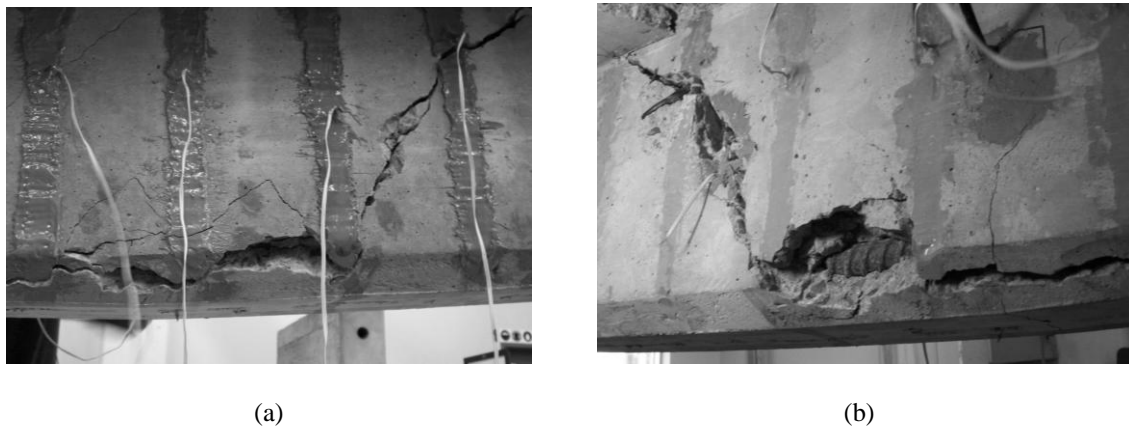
Common failure mode in beams strengthened with NSM method: (a) Cracking pattern; and (b) detachment of concrete cover.
